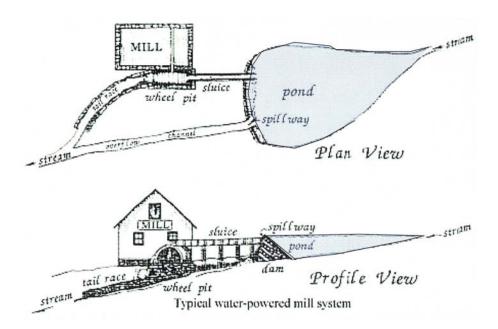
Plan and profile views make it easy to see how water slowed down and ponded behind dams and allowed sediments to build up behind the dams.
